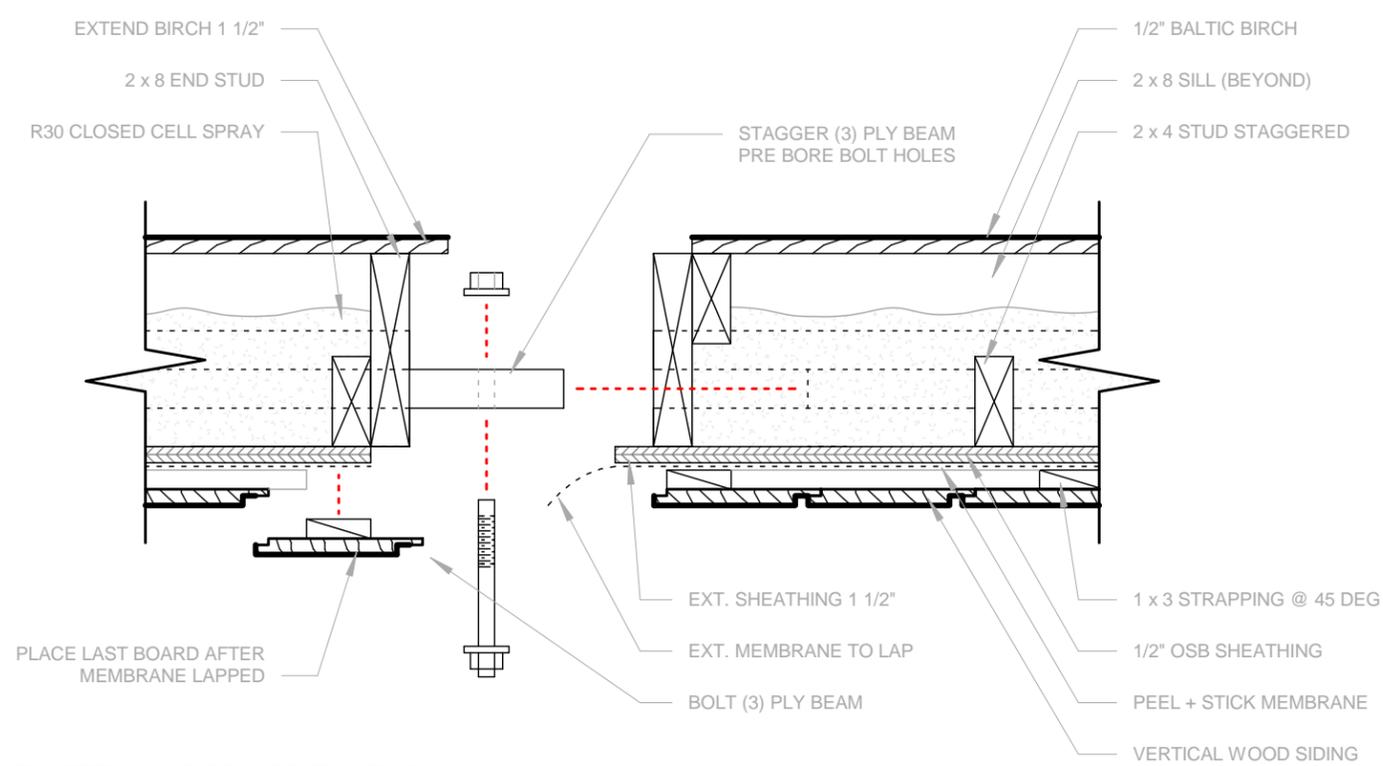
TYPICAL MODULE CONNECTION (PLAN)
